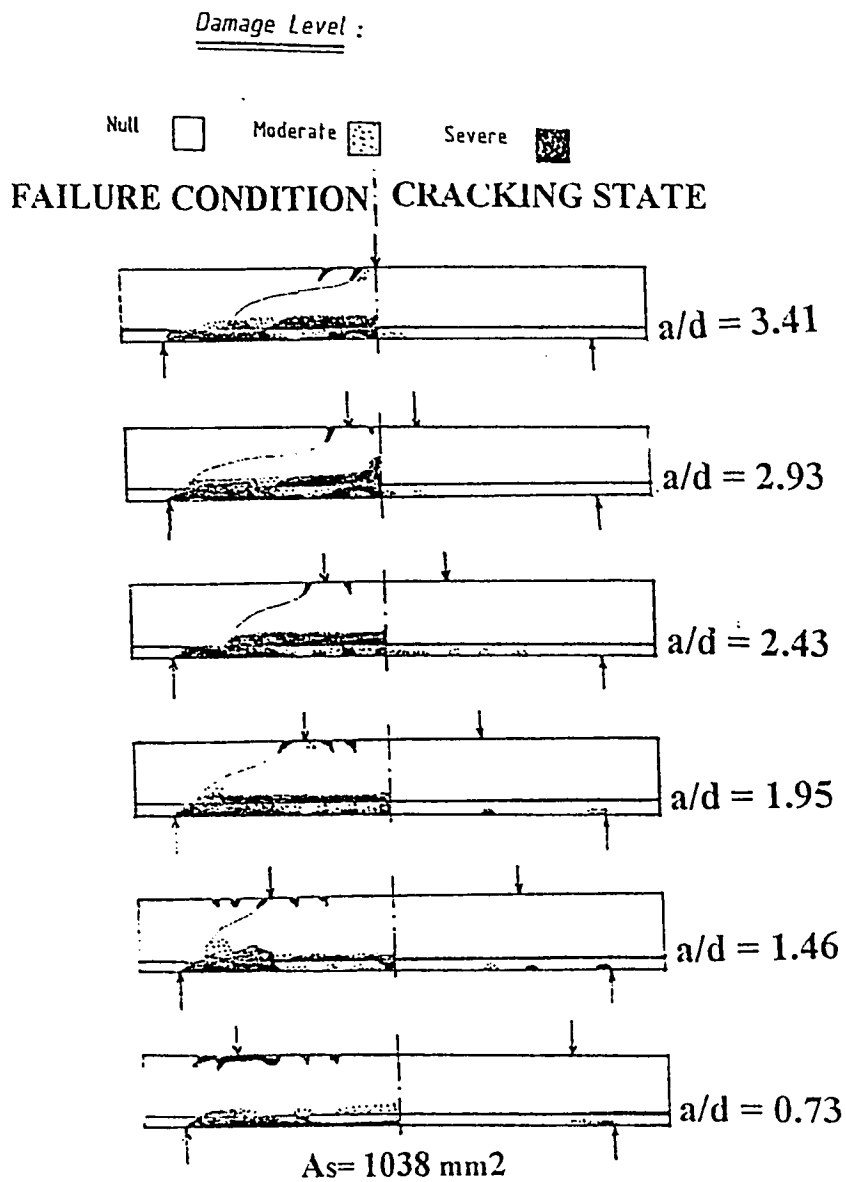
Effect of shear span to depth ratio on damage pattern for heavily under-reinforced concrete beams without shear reinforcement
